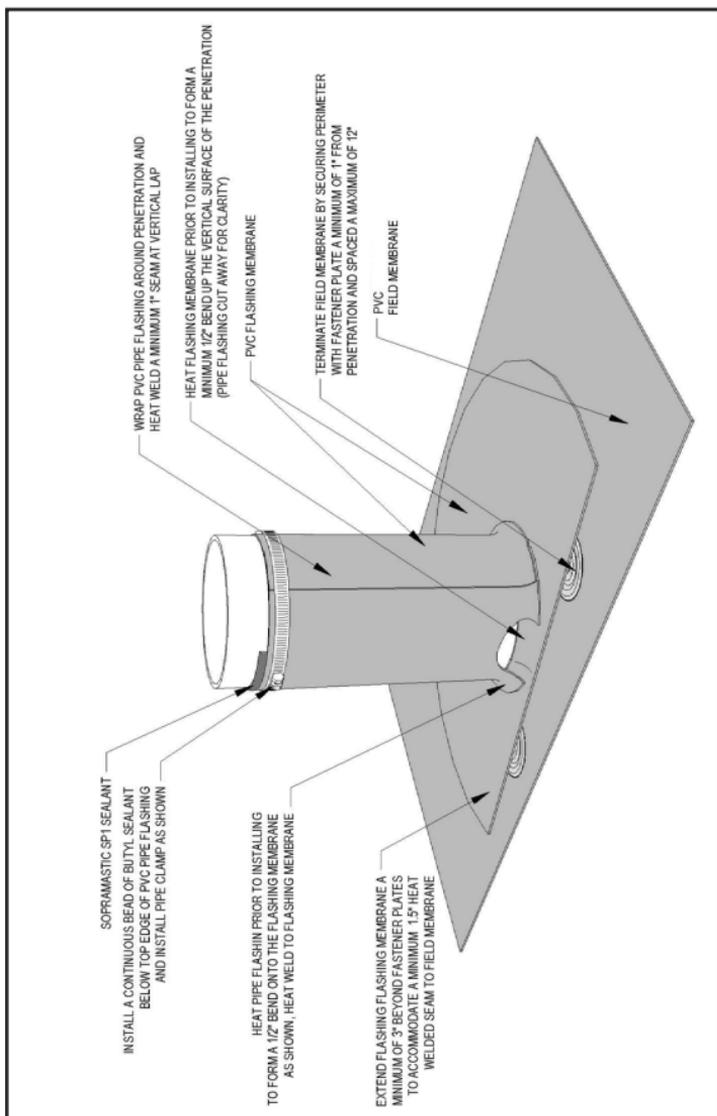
PVC Field Membrane At Penetration With Field Fabricated Pipe Flashing
